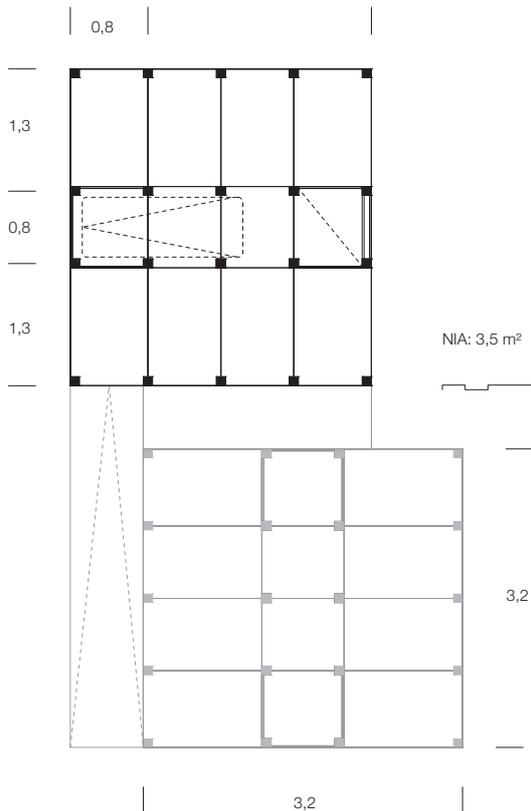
“Living in the Wall” - floor plan reconstruction
